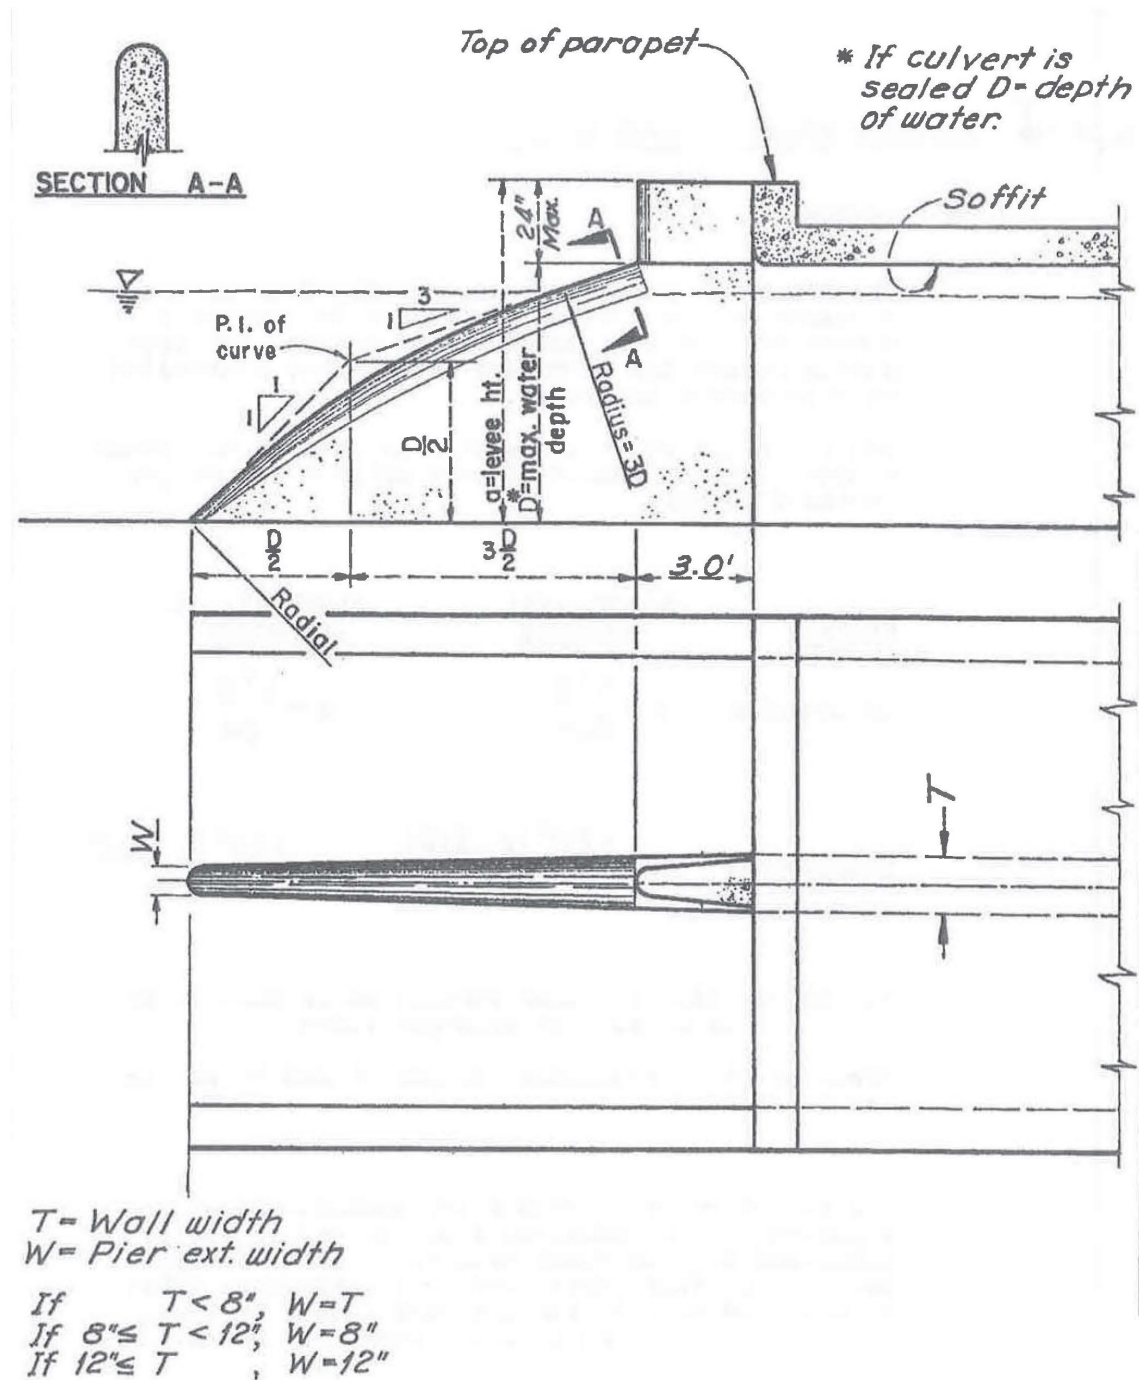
Typical Pier Extension for Bridge/Culverts (LACFCD, 1982)
